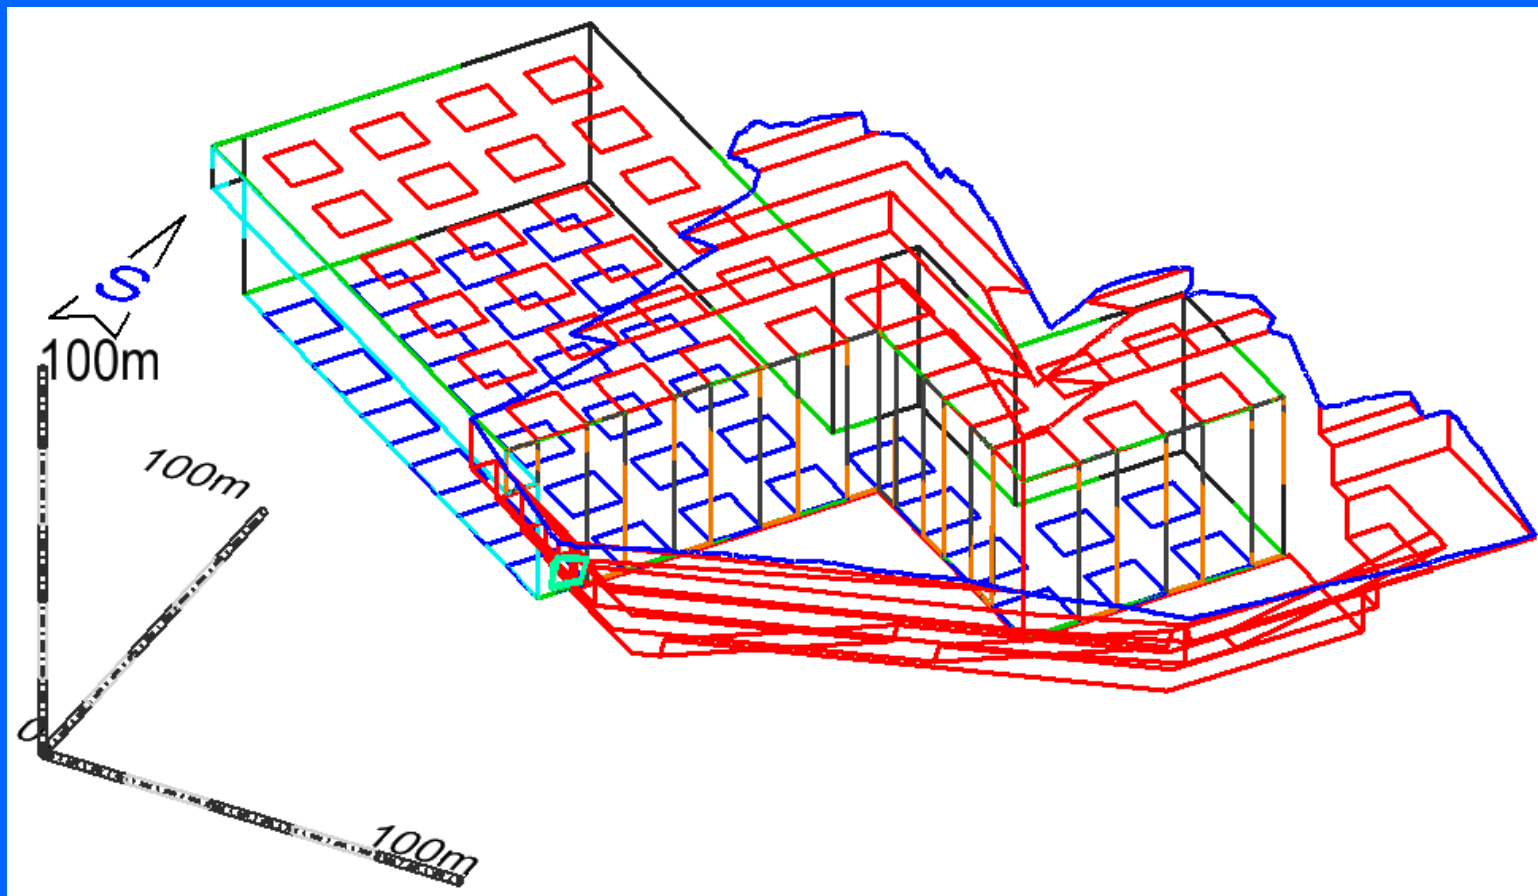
Geometrization (creations) of underground and surface mining works project solution-final version
